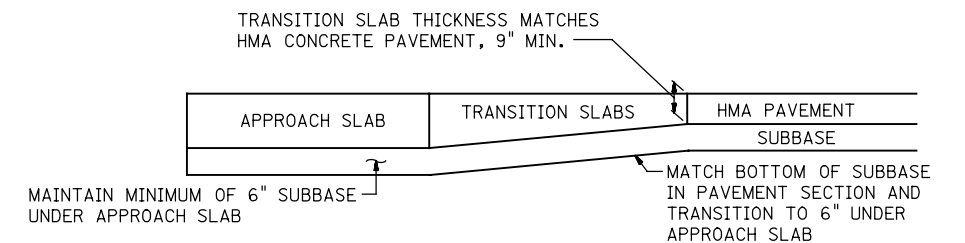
DETAIL FOR BRIDGE APPROACH SLABS WHEN SKEW ANGLE IS 35° OR GREATER
